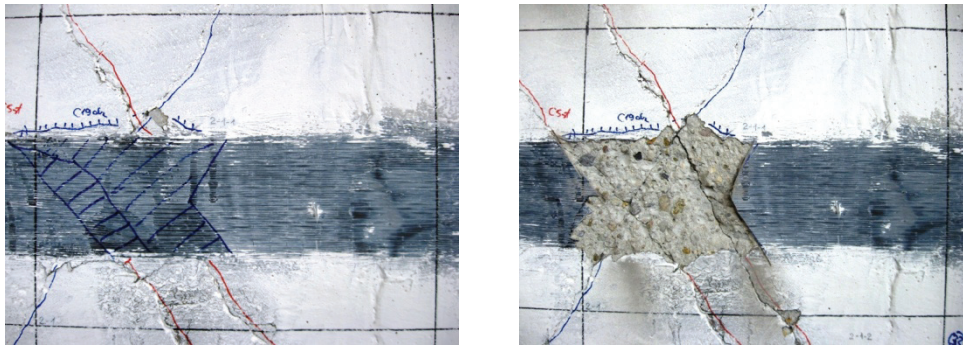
Failure detail PRCWP 3-S/E1-T/R: FRP debonding at inclined crack crossing on pier#2 (observation grid 2-1)
